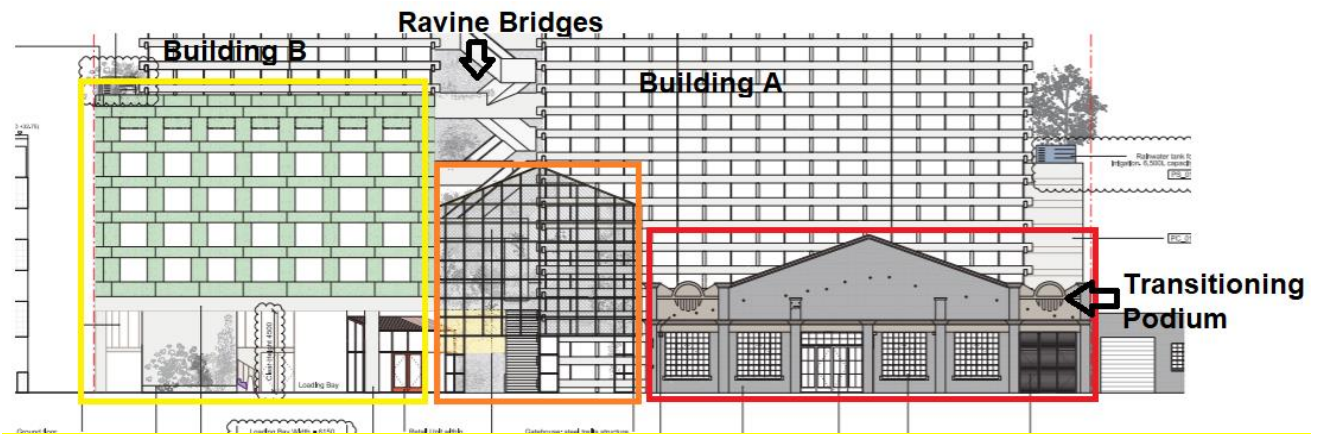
Portions / towers identified as Buildings A and B and transitioning street podium.
